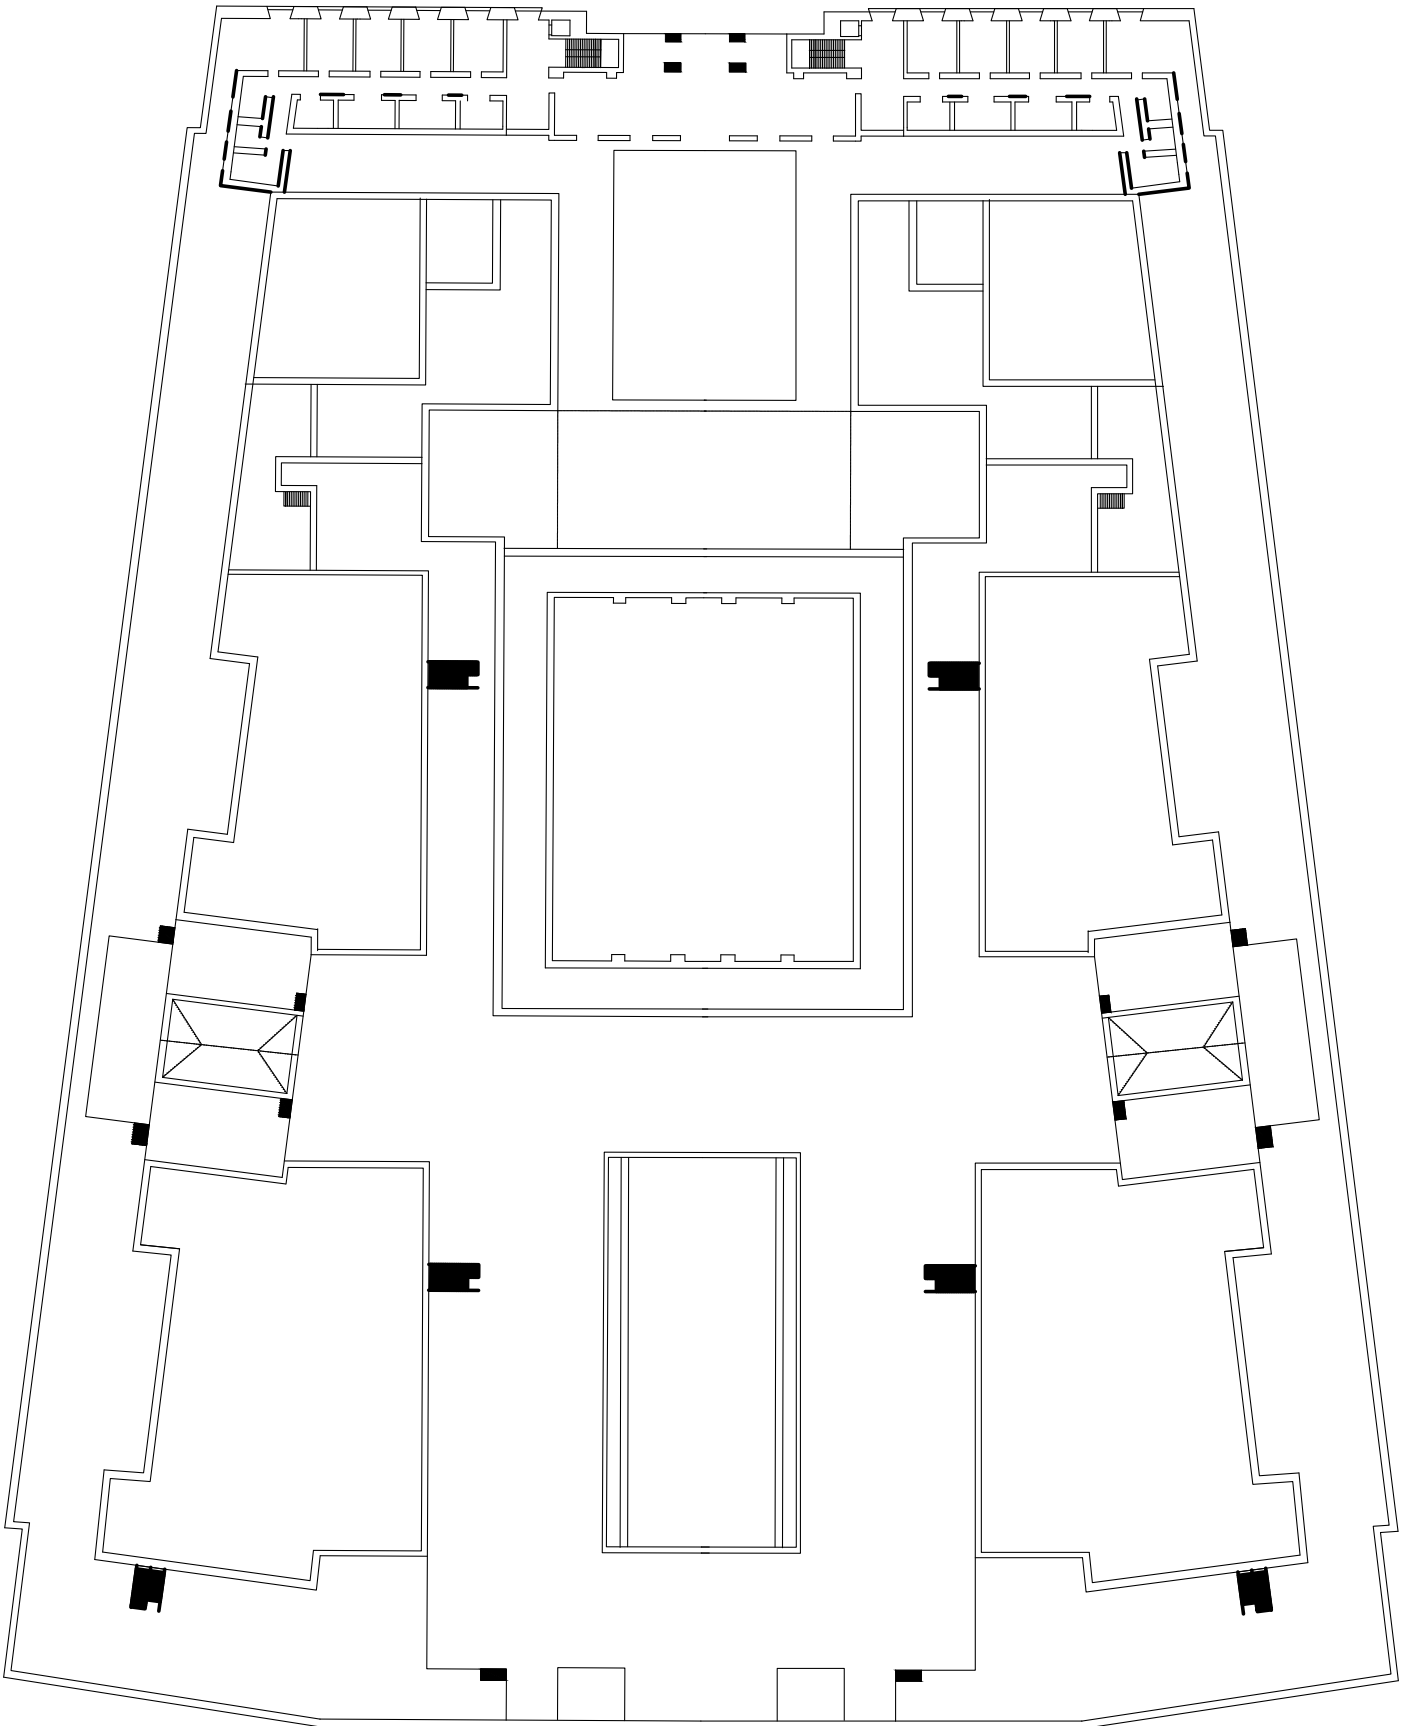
Additional Level Plan, showing the new offices.
